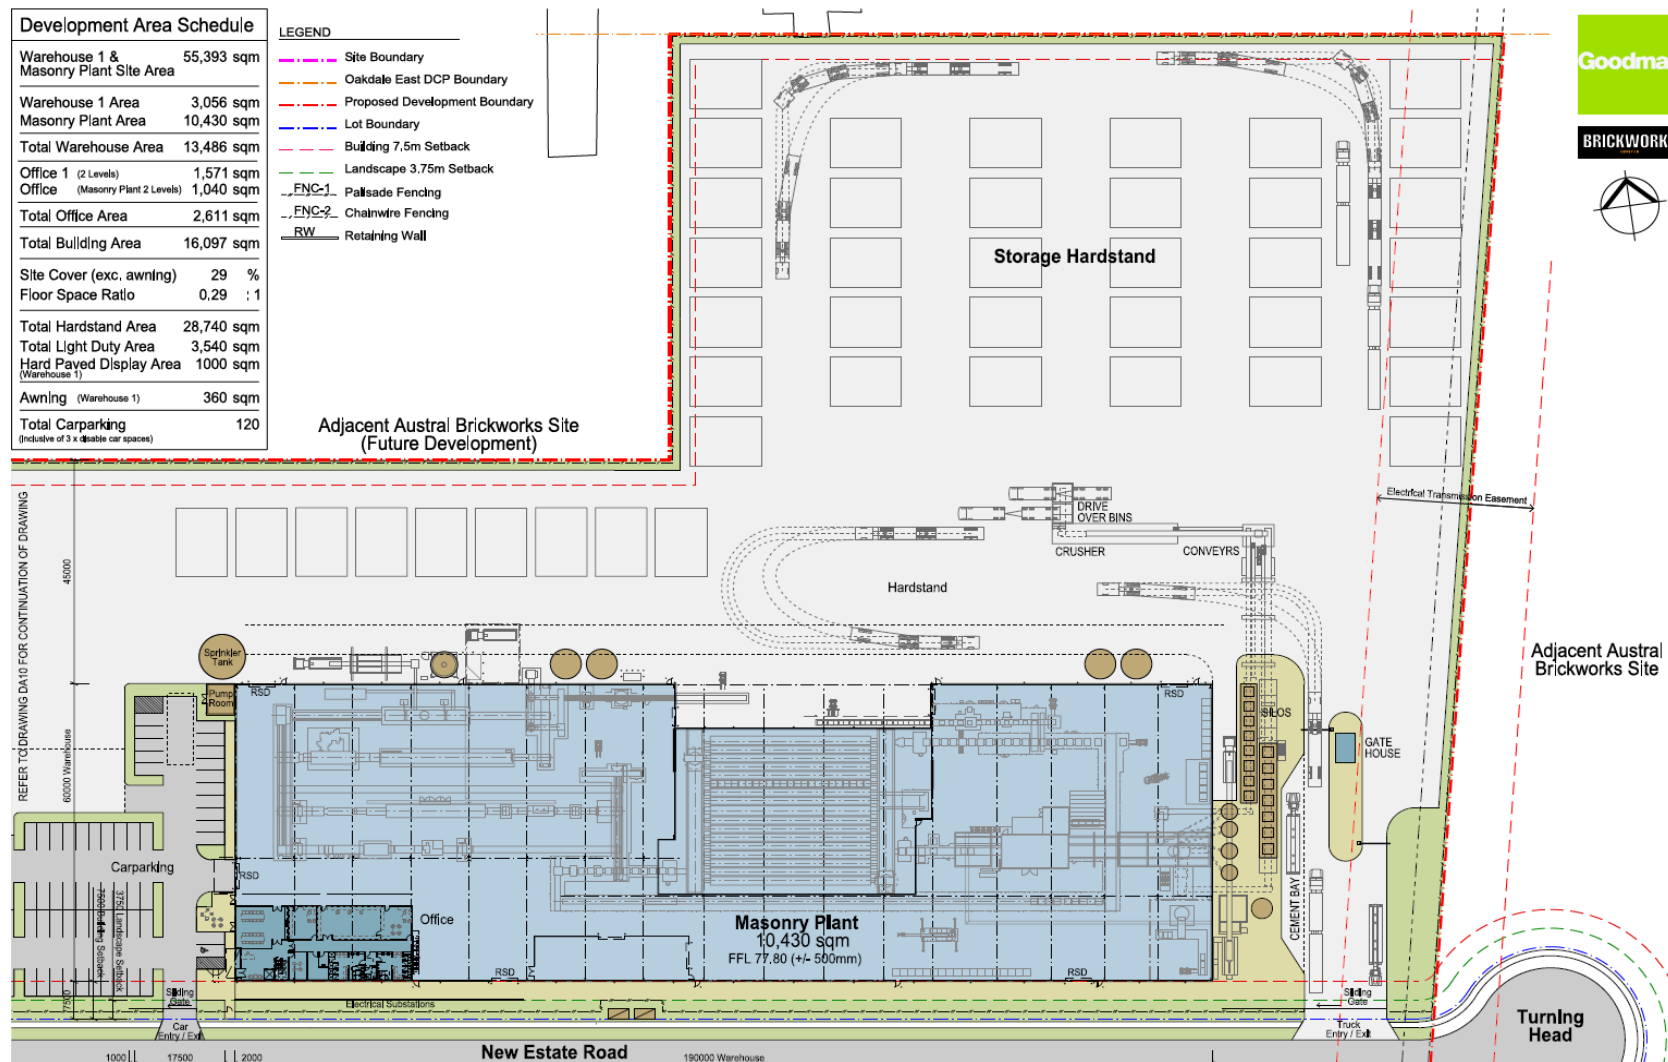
State Significant Development Application – Warehouse 1 Site/Floor Plan
